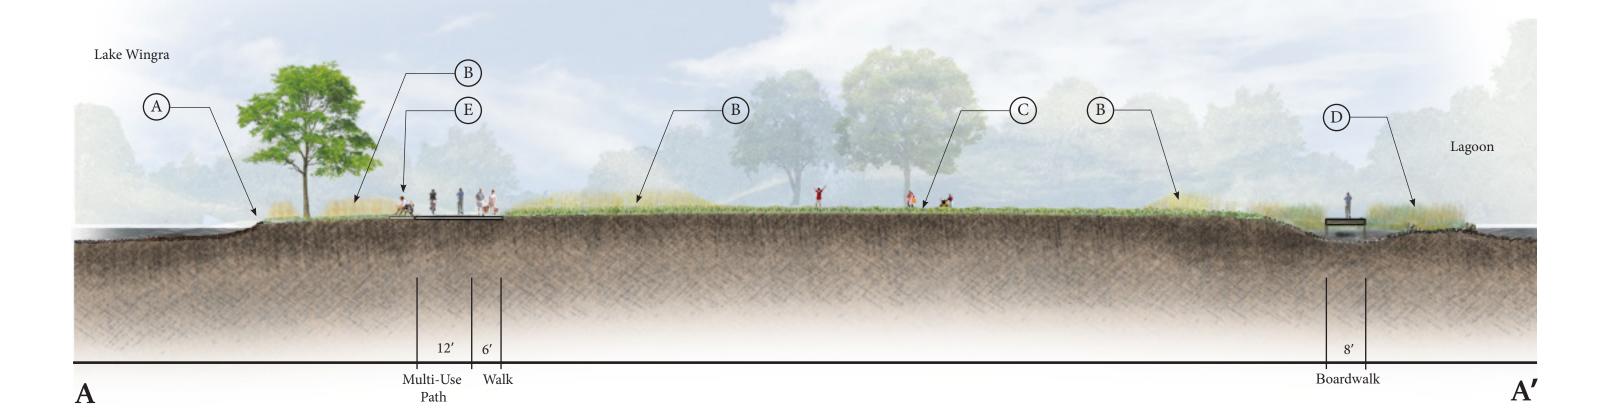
Vilas Park Drive and Peninsula Cross Section
